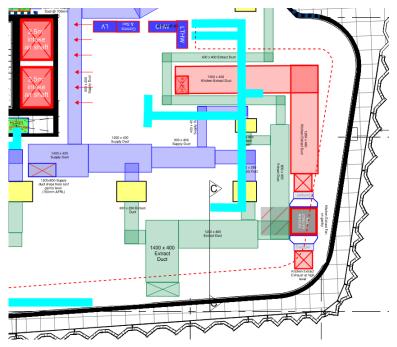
Proposed layout of roof including kitchen extract ventilation plant.
